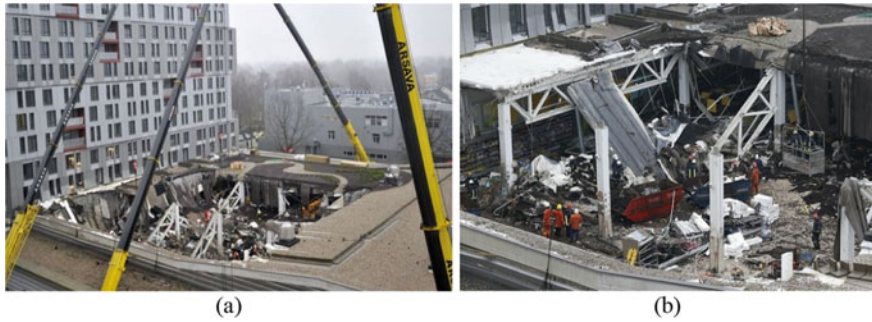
Maxima shopping center steel structure roof collapsed in Riga a Global collapse and b local collapse [7, 73]
